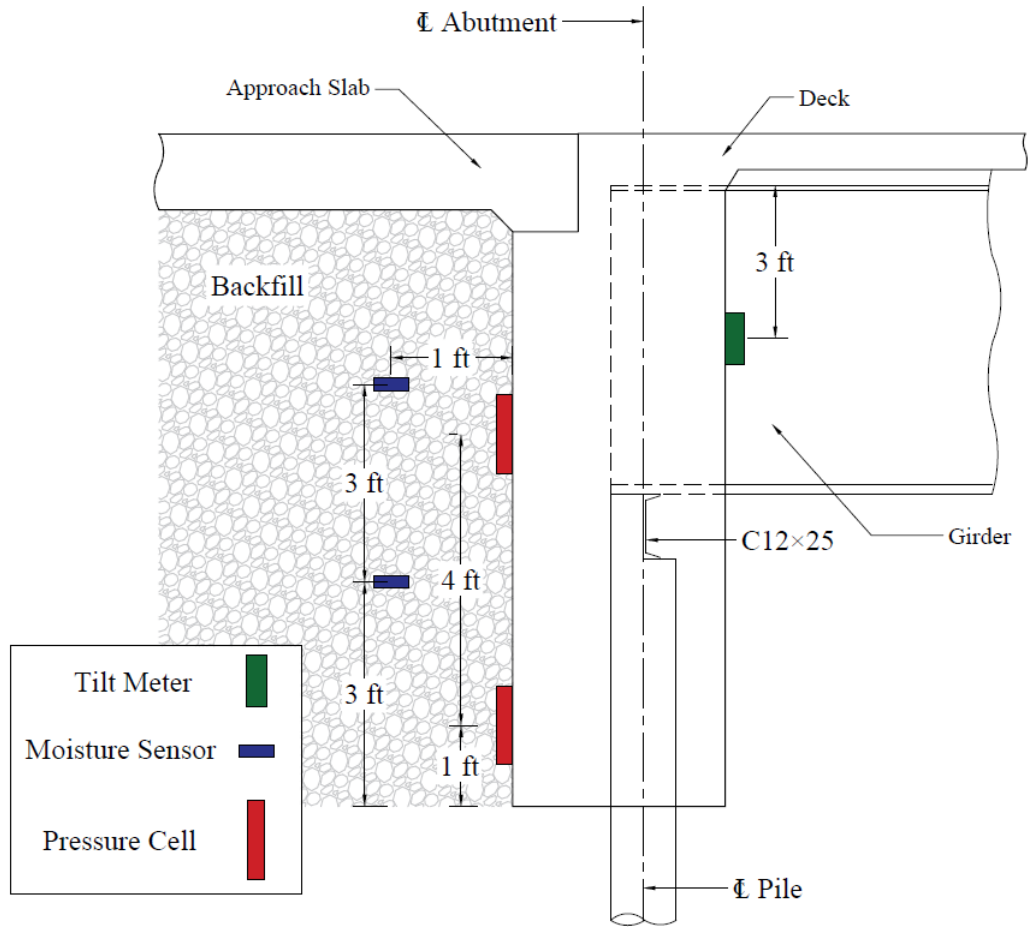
Cross Section of the Abutment with its Installed Instruments
